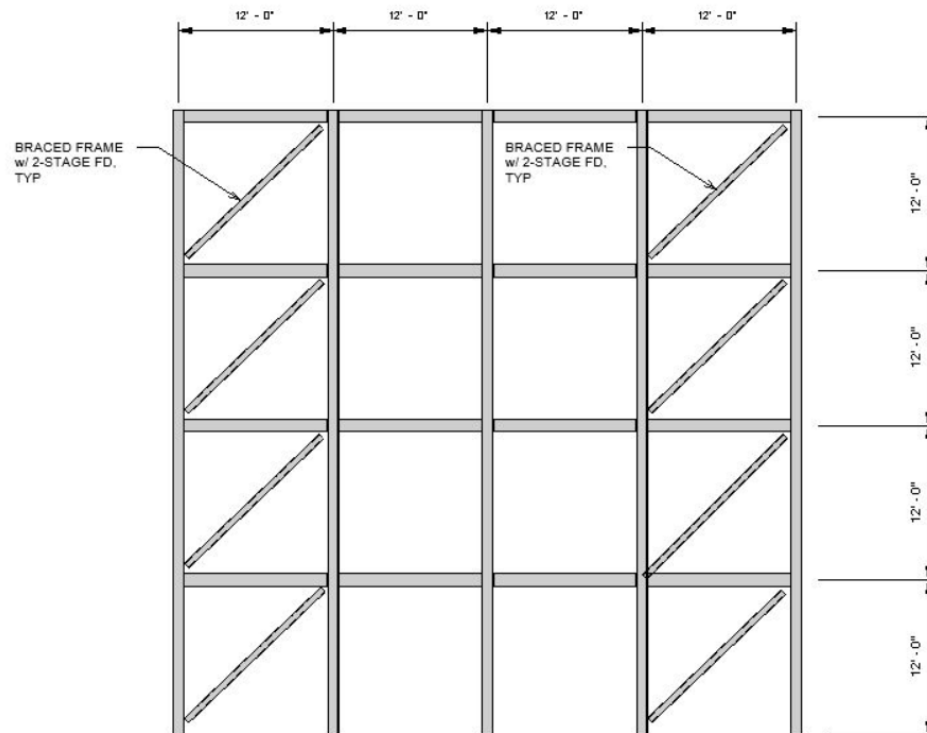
4-Story, 4-Bay Friction Damper Model Building Elevation.
